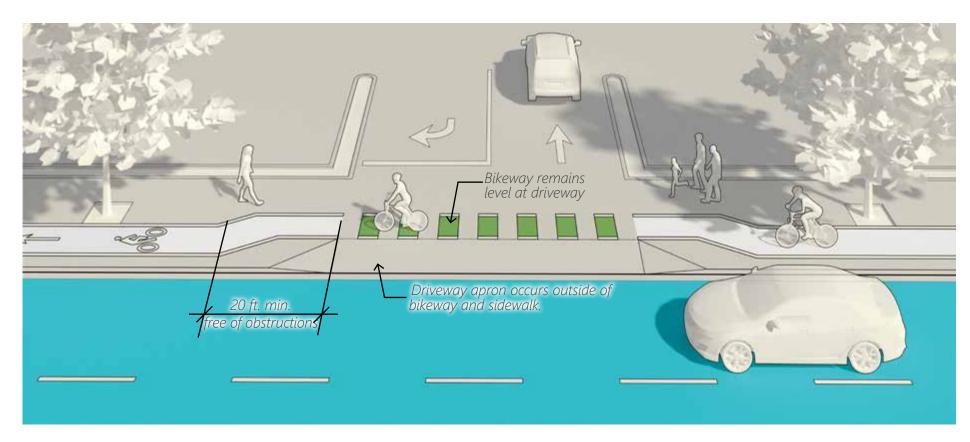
Sidewalk-Level, Class IV Bikeway at a Driveway.
